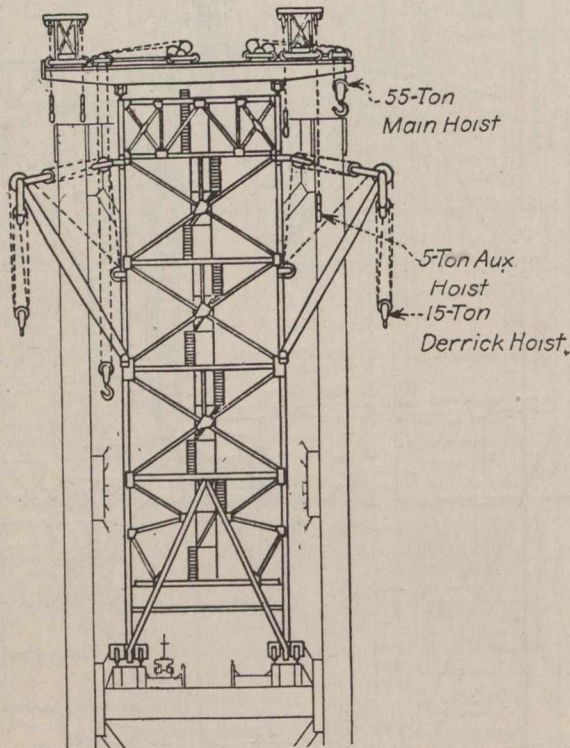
End Elevation of Erection Tower, Showing Location of Hoists.
